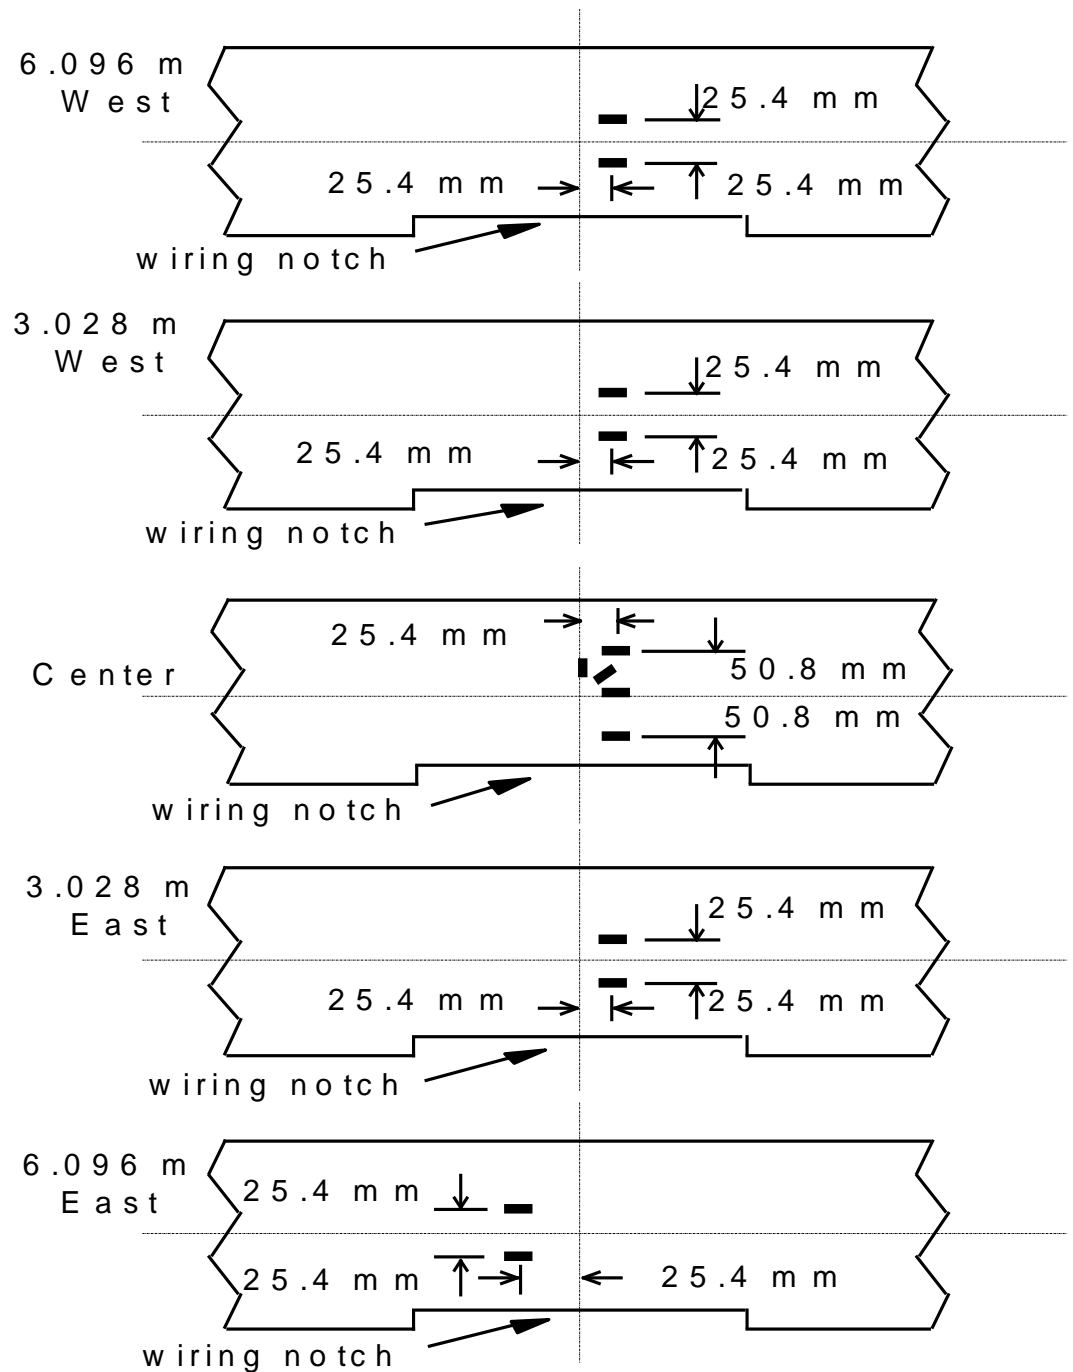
Locations of gauged girders in the Lighthouse Bridge
